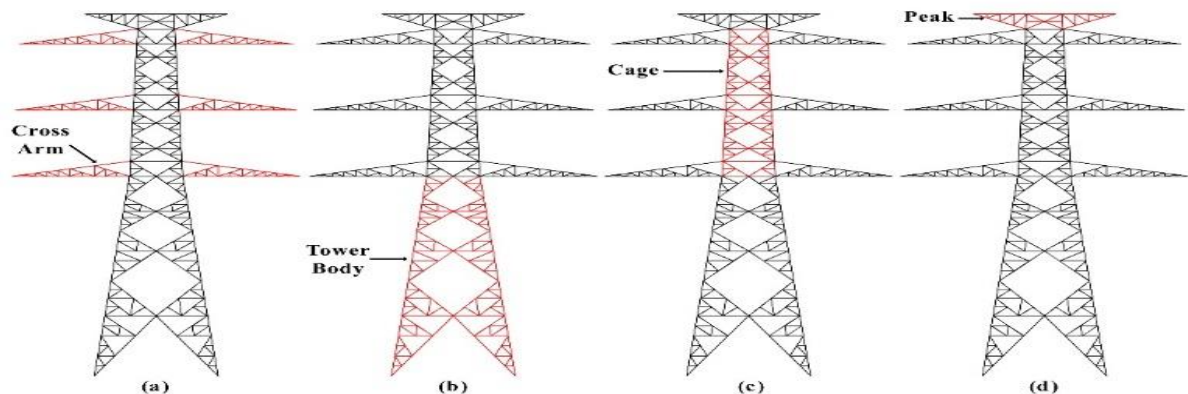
Transmission tower parts a- Cross arm b - tower body c- cage d-peak
